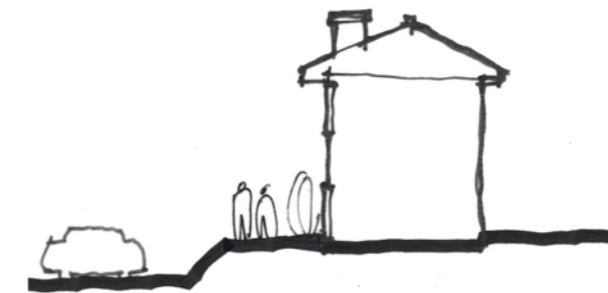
Cross section through a part street where houses are slightly elevated from the street
